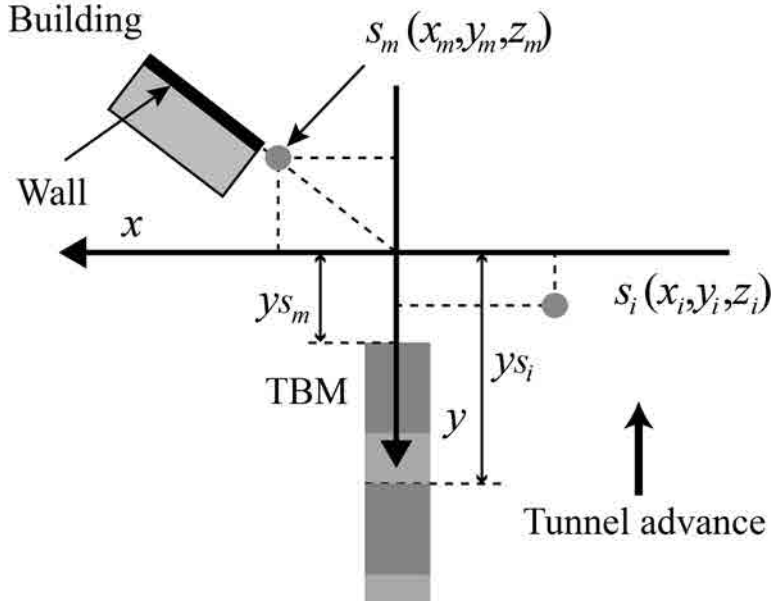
Position of the analyzed building, tunnel face, and measurements.
